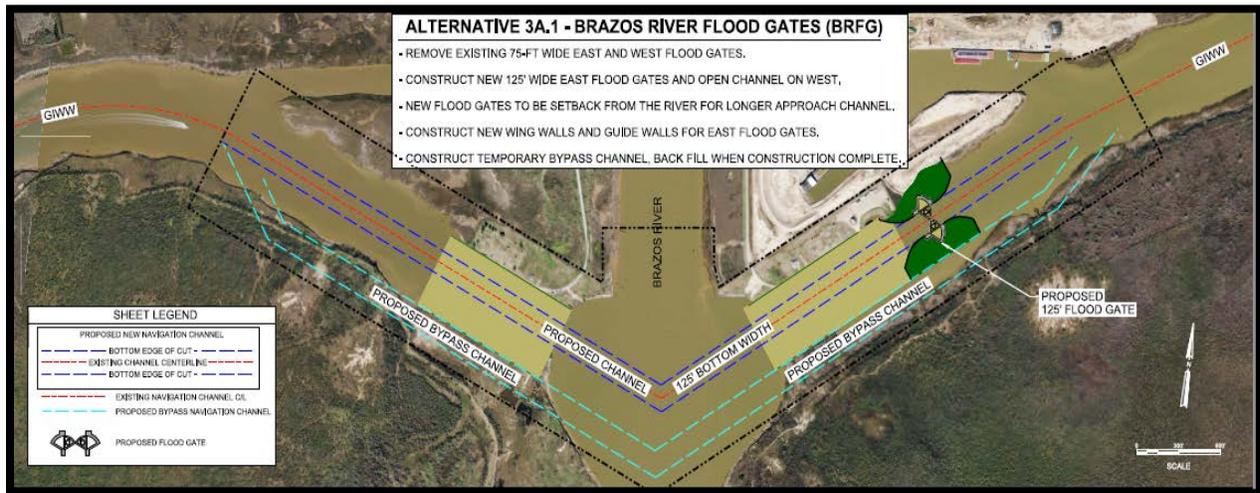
Recommended BRFG Plan – Alternative 3a.1
